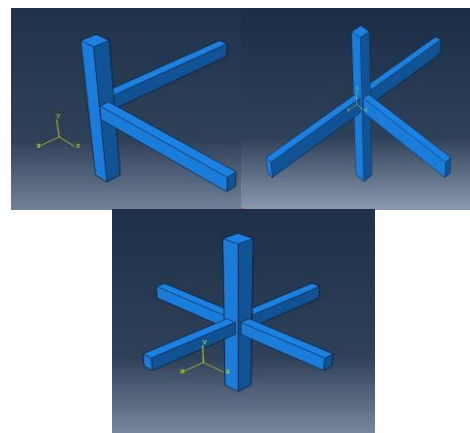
represent Corner, Exterior, Interior Joint connection model on Abaqus 2024
